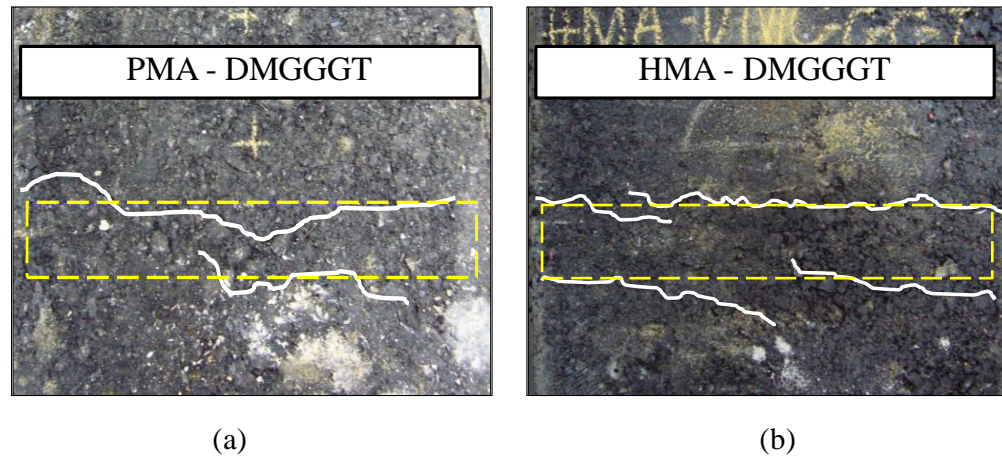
Surface cracking in overlying reinforced with geogrid together with geocomposite pavements: (a) PMA pavement; and (b) HMA pavement
